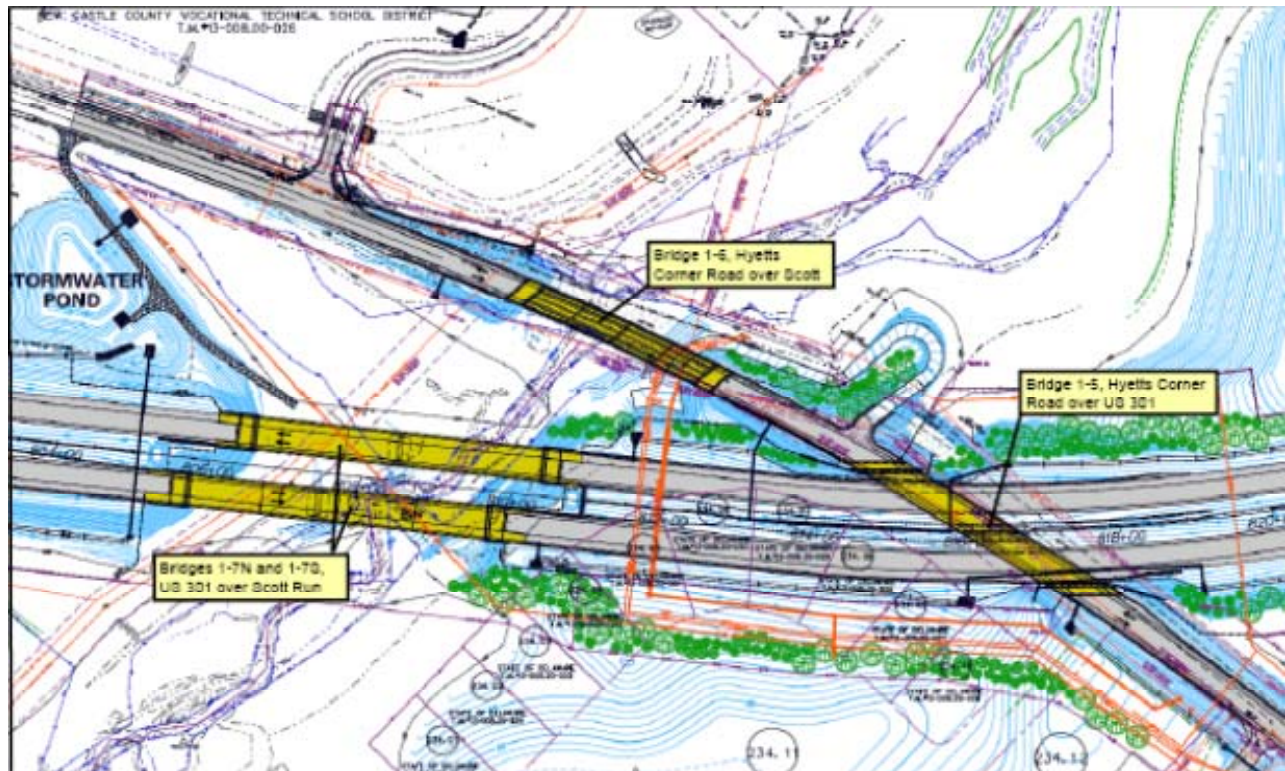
Design Refinement 4- Modification of Bridges 1-5, Hyetts Corner Road over US 301, and Bridges 1-6 and 1-7, Hyetts Corner Road and US 301 over Scott Run
